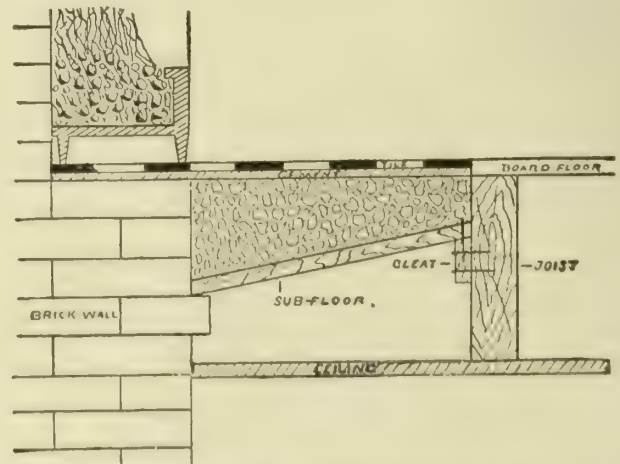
WOOD SUB-FOUNDATION FOR HEARTH
